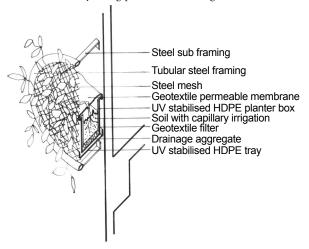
Modular mesh wall planting (Boughouse, 2003)
